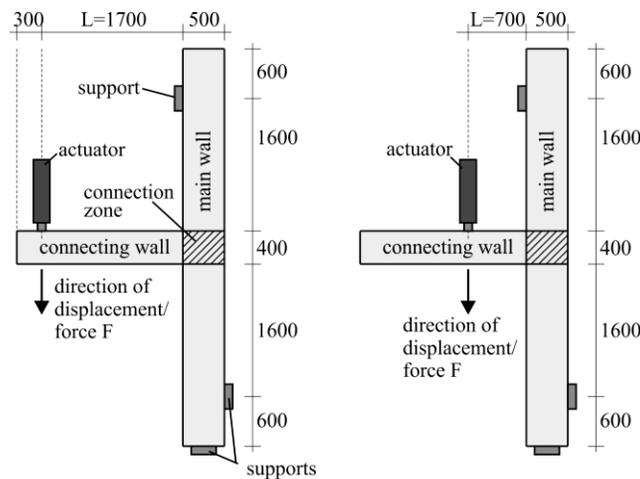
Wall to wall bending dominated (left) and shear dominated (right) test setup
